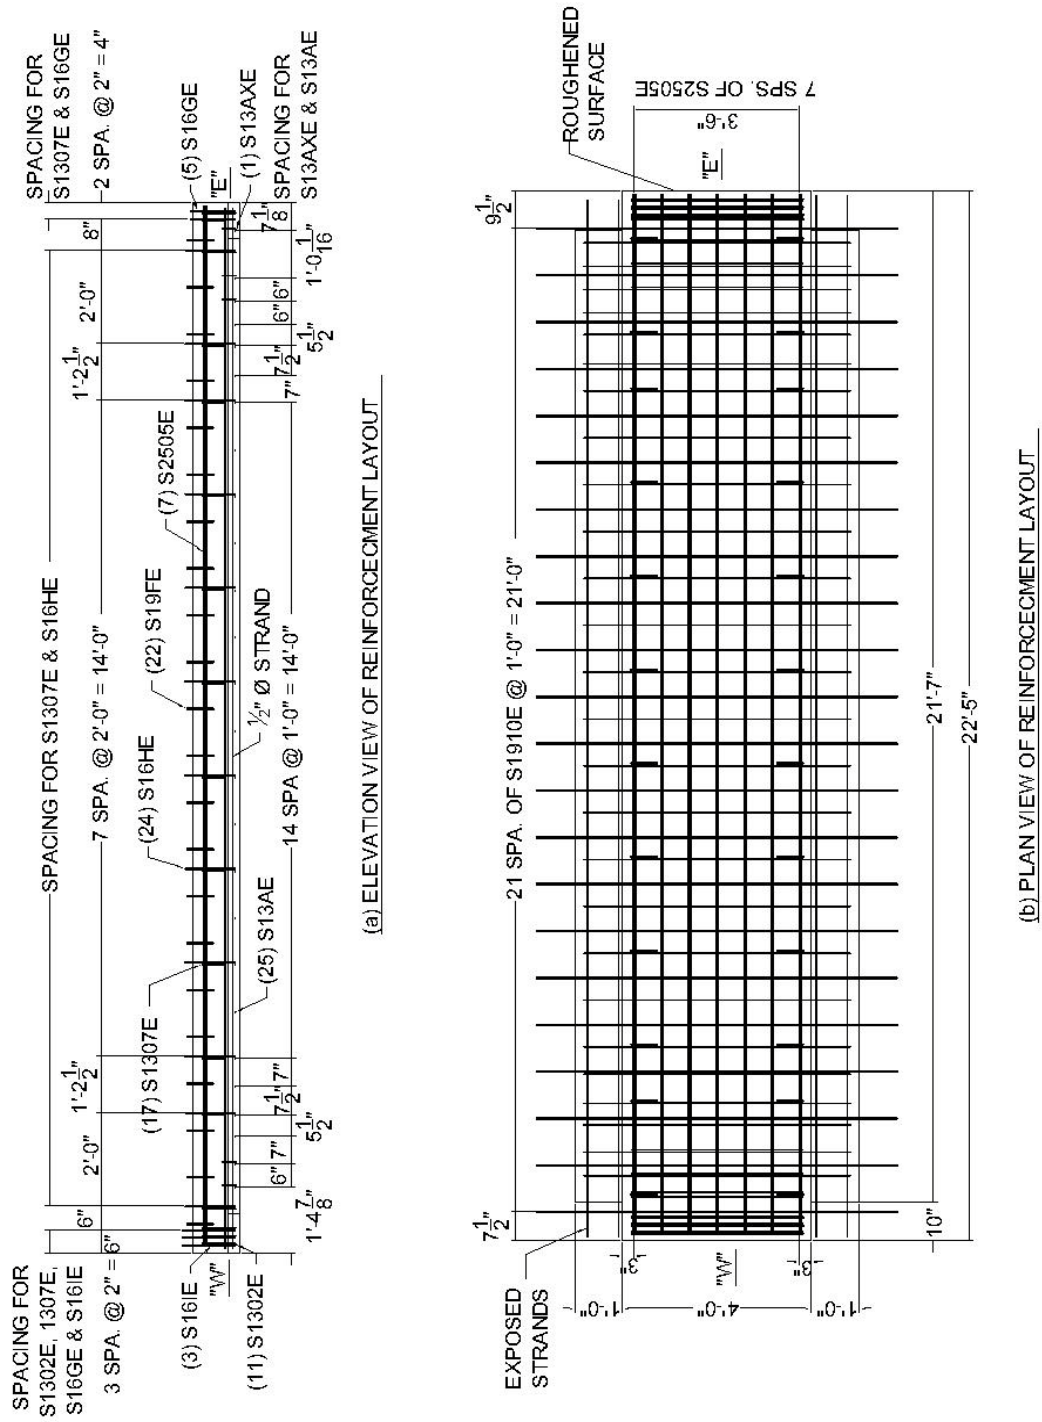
Elevation and plan views of reinforcement layout for precast beam 1S
